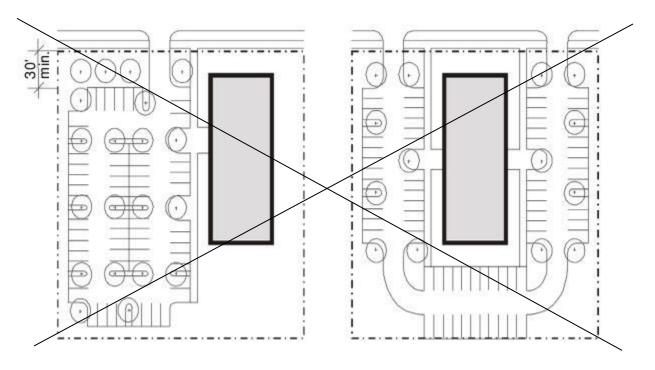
Figure Exception to 20.50.140(E): A consolidated parking scheme (left) with more than 30 spaces may be permitted if it is buffered from the street and produces improvements from a separated parking scheme (right), such as a better open space layout, fewer curb cuts, etc.
